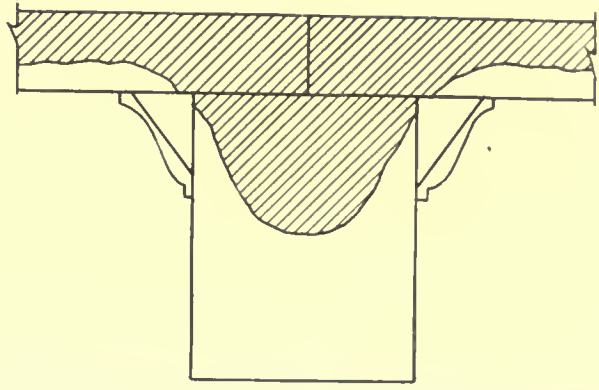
Section through roof plank showing effect of a moulding in bringing the moisture line, limiting fungus growth, outside the edges of the supports, resulting in the rotting off of the ends of the planks.
